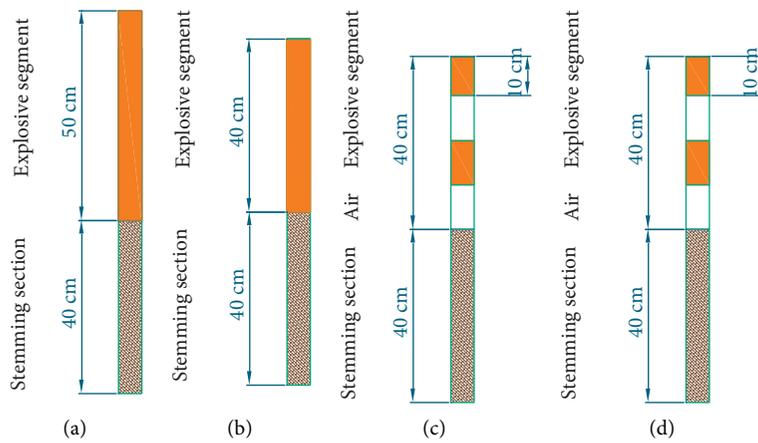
The charging structure: (a) charging for cut holes, (b) charging for auxiliary holes, (c) charging for periphery holes, and (d) charging for bottom holes.
